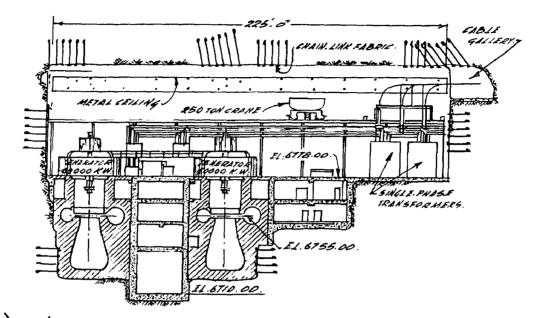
(9) LONGITUDINAL SECTION OF MORROW POINT UNDERGROUND POWER PLANT SHOWS FLOOR SLABS WHICH SERVE AS STRUTS OR BRACES BETWEEN THE ROCK WALLS. NO EXPANSION JOINTS ARE TO BE USED IN THE PLANT SINCE THE MINOR TEMPARATURE CHANGES WILL NOT PRODUCE EXCESSIVE EXPANSION.
